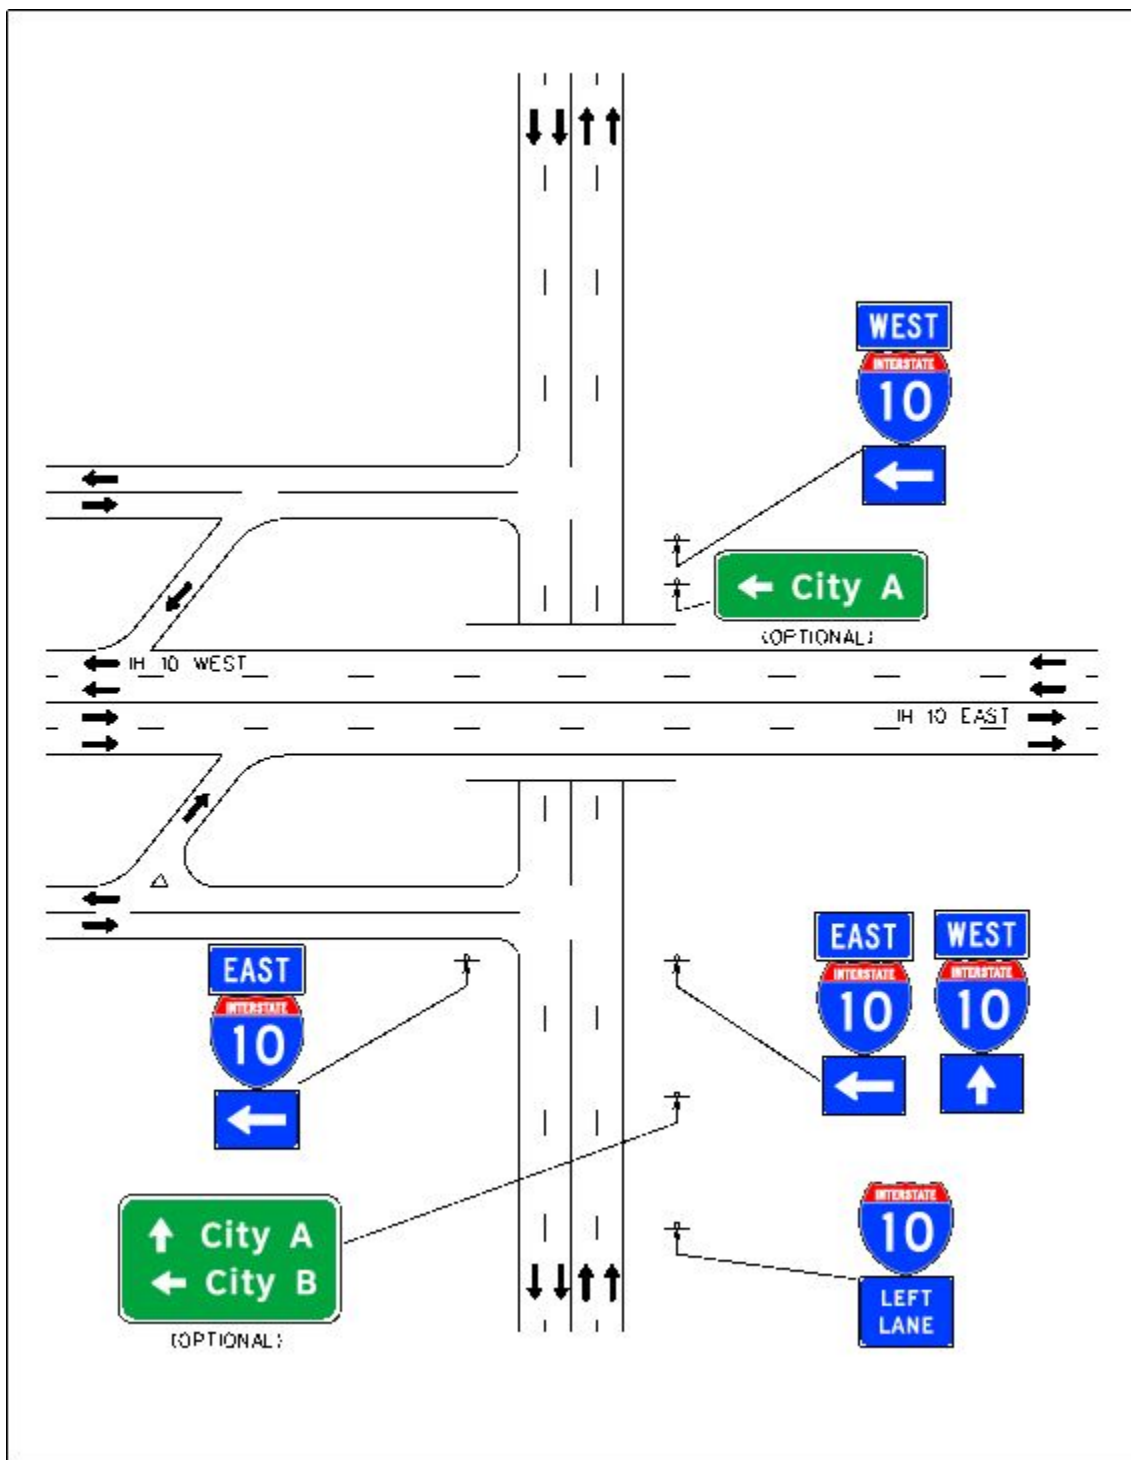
Cross-street route signing for left-direction entrance ramp located on the far-left frontage road and right-direction entrance ramp located on near-left frontage road.
